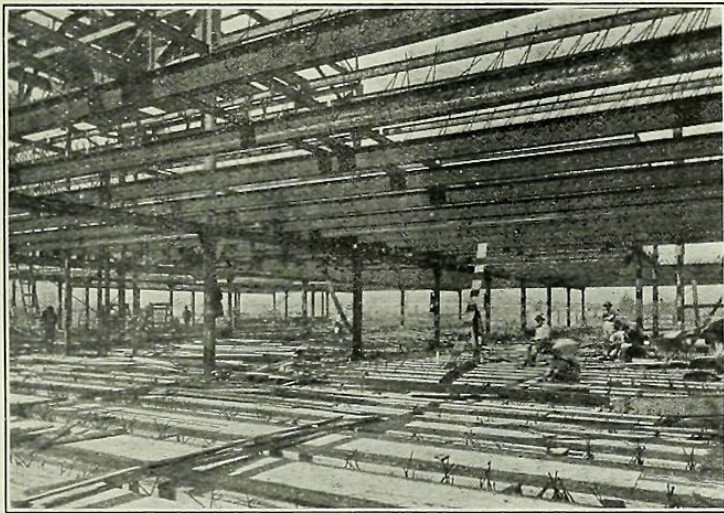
ILLUSTRATING METHOD OF CONSTRUCTION AND SHEER BARS WHICH ARE BENT OVER IN CONCRETE OF FLOOR SLAB.
